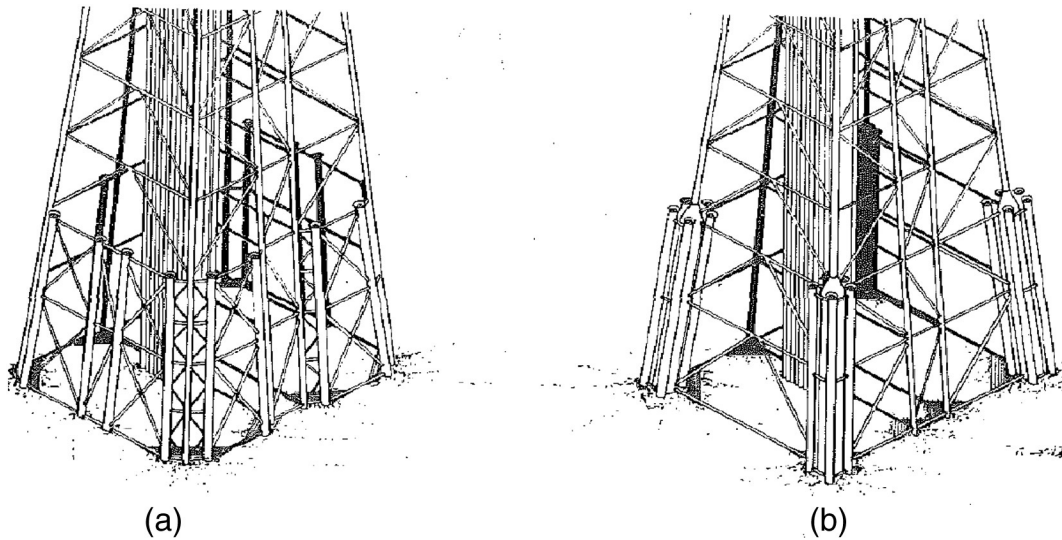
Typical foundation pile arrangements where grouted pile – sleeve connections are used; a) Main and skirt Piles, b) Cluster piles [1].
